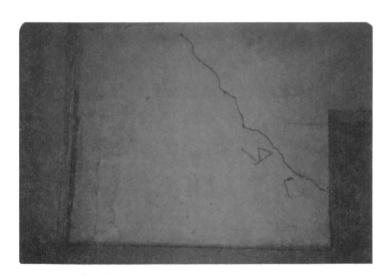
Example of Cracks in Internal Walls of Laboratory Wings.
